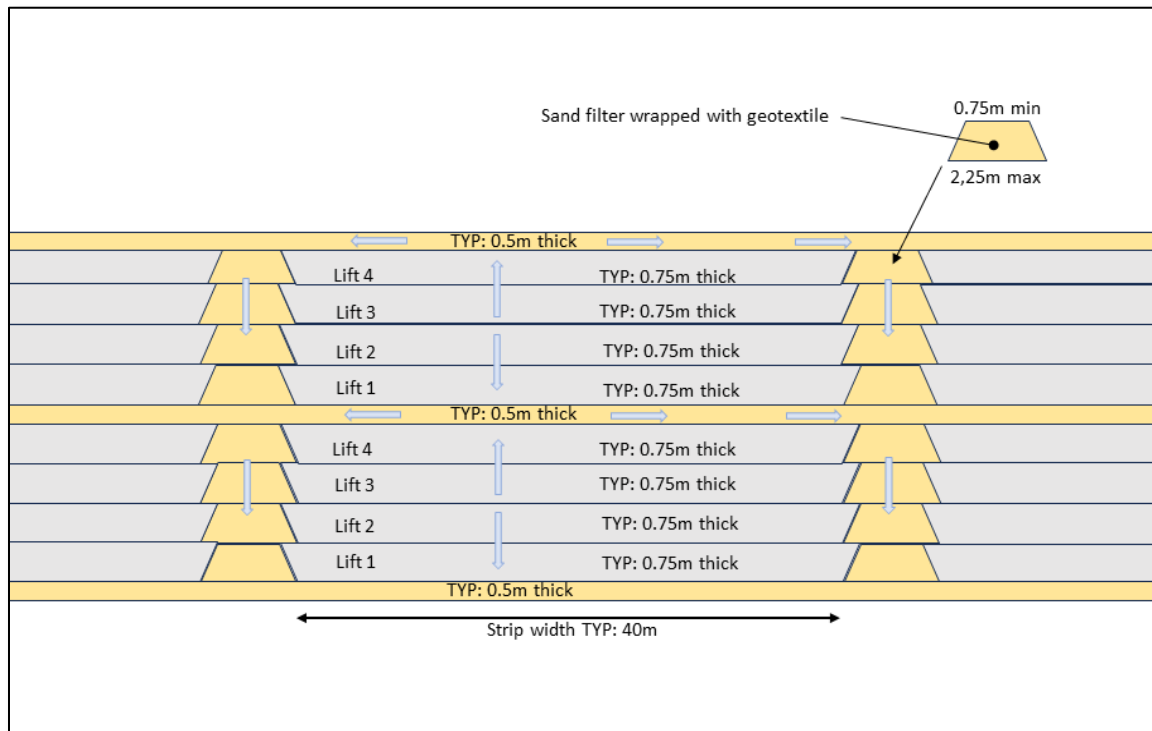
TYPICAL DST AREA CROSS-SECTION
